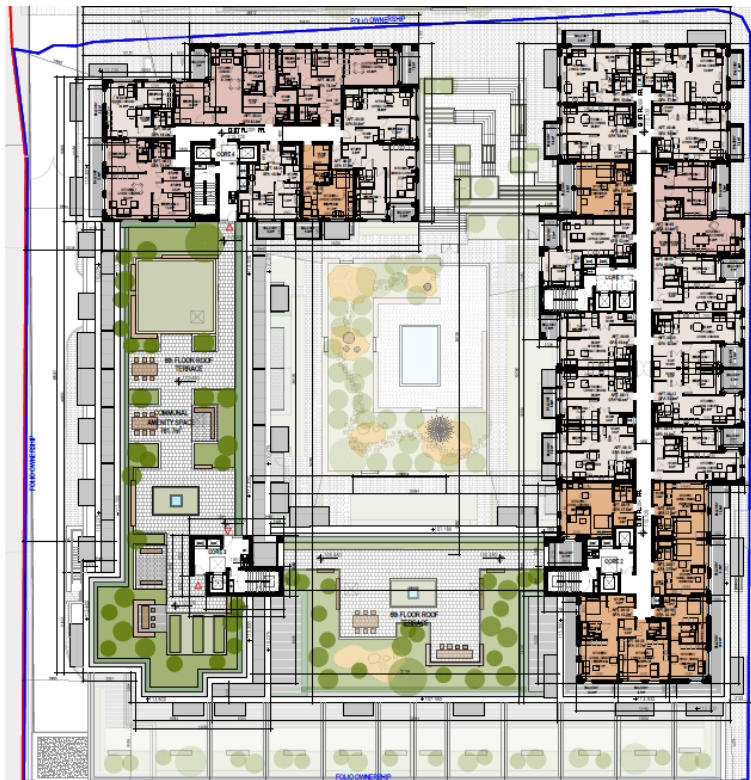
Eight floor plan. We note the provision of a communal roof terrace at this level. 8 no. studio apartments, 16 no. one-bedroom apartments and 4 no. two-bedroom apartments are provided at this level.
